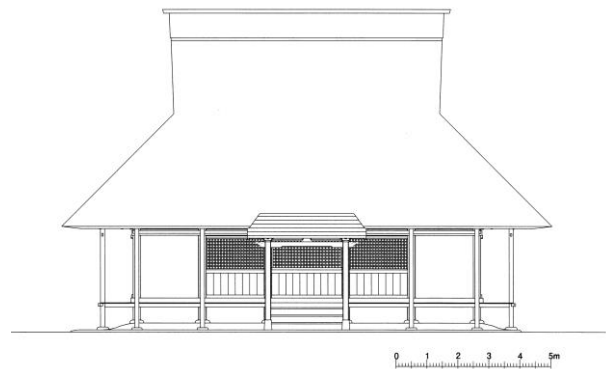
shows one-story wooden structure with thatched roof, Yakushi-doh structure, which was built an old Japanese traditional framed-construction method and have a thatched roof instead of tile. Yakushi-doh structure was dedicated in 1617 to deity “Bhaisajyaguru”, who has been believed in a Buddha able to cure all ills, and has been an important cultural asset. Figure 1 indicates floor plan, elevation one, and cross section ones of Yakushi-doh structure. The width, depth, and height of Yakushi-doh structure are 13.211m, 11.756m and 10.254m, respectively. Photo 2 shows a post erected on a foundation stone under Yakushi-doh structure floor. There are many posts erected on their foundation stones with flat plane under Yakushi-doh structure floor, and they are not fixed on their foundation stones. Consequently, this system is likely to be a seismic base isolation. In this paper, the effect of the post fixing condition under wooden structure floor on seismic response of Yakushi-doh
